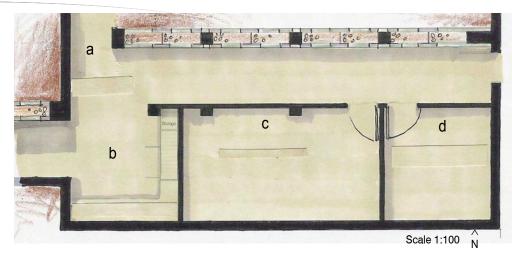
Plan of administrative spaces (see section 7, New Plan). a - Main Parrot feeding Schedule Zone; b - Main Parrot Food Preparation Zone; c - Training and Meeting Office; d - Breeding and Conservation Office.
